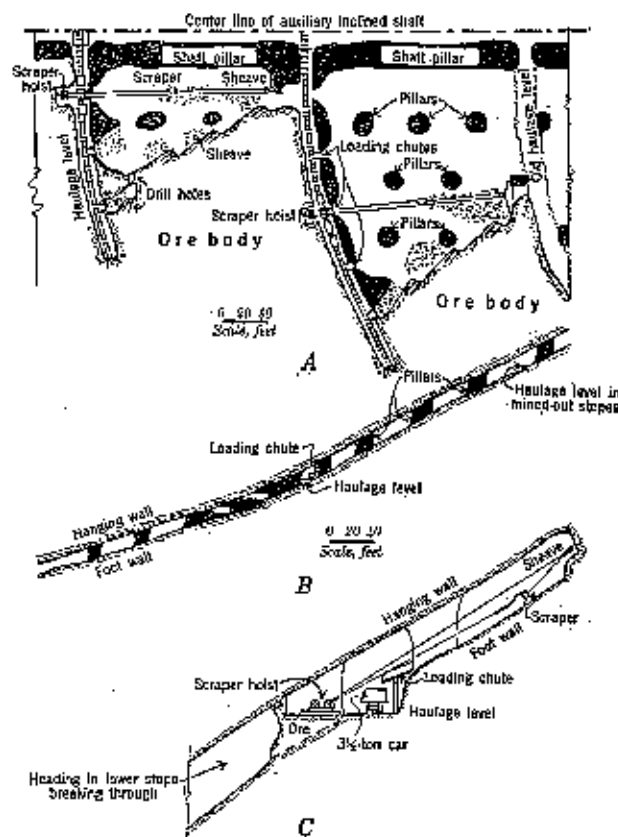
Scraper stopes, Mineville, N. Y.: A, Plan of a stope; B, cross section through stope; C, enlarged cross section showing scraping to chute.
